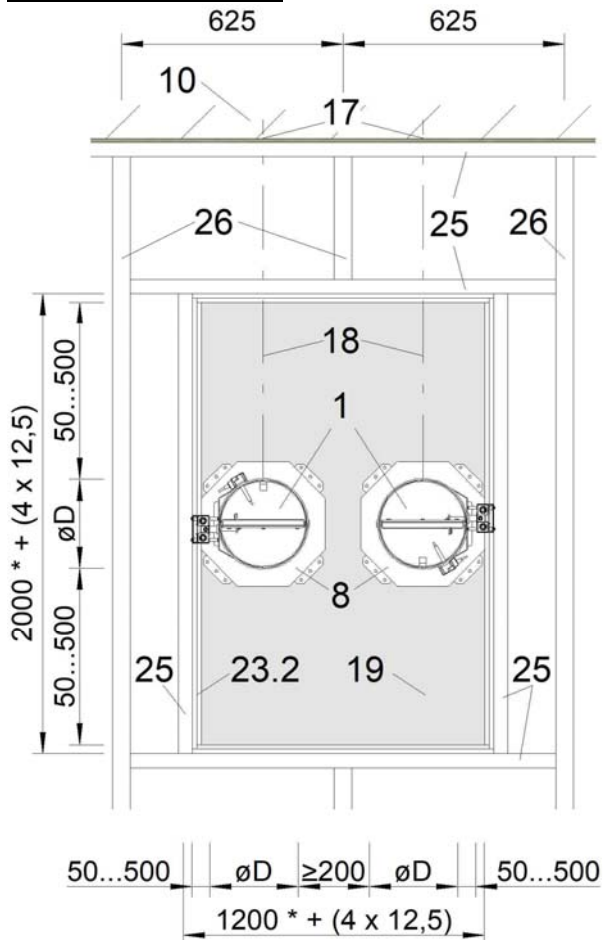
Installation in metal post wall (wall thickness = 100 mm)
